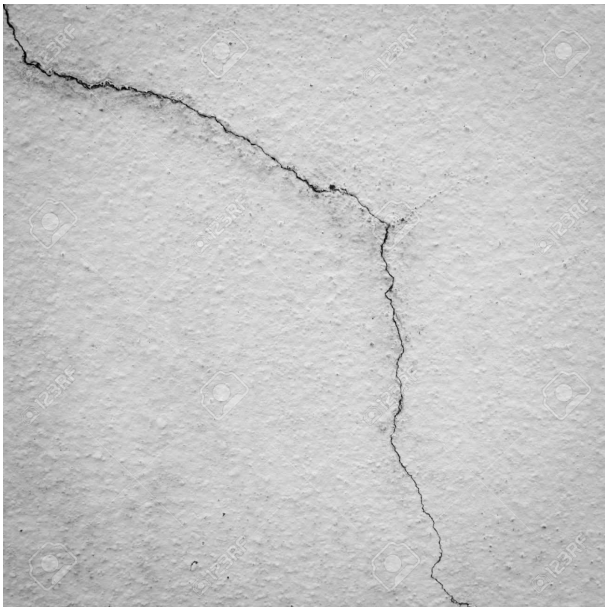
Crack in concrete wall (Arbsuwan, 2017).
